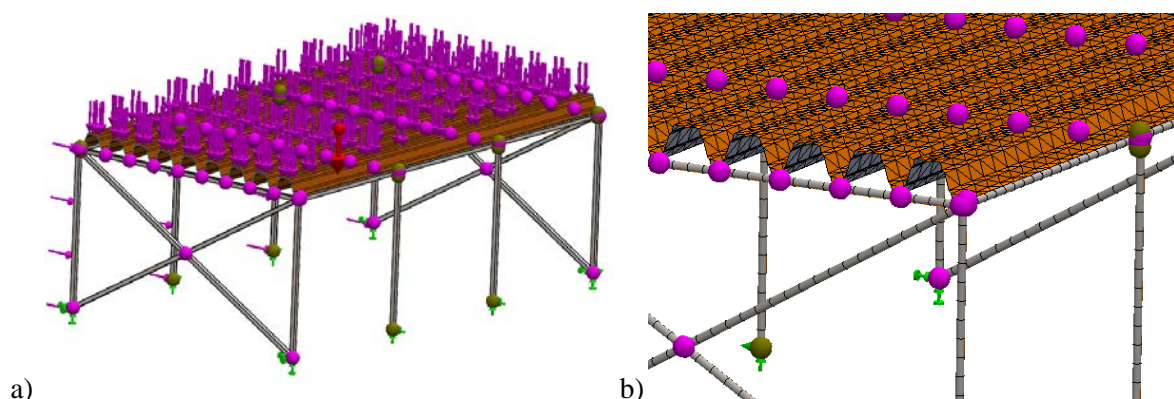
The open plan building with a shallow roof: a) stabilized by wind bracing and b) its FE model.
